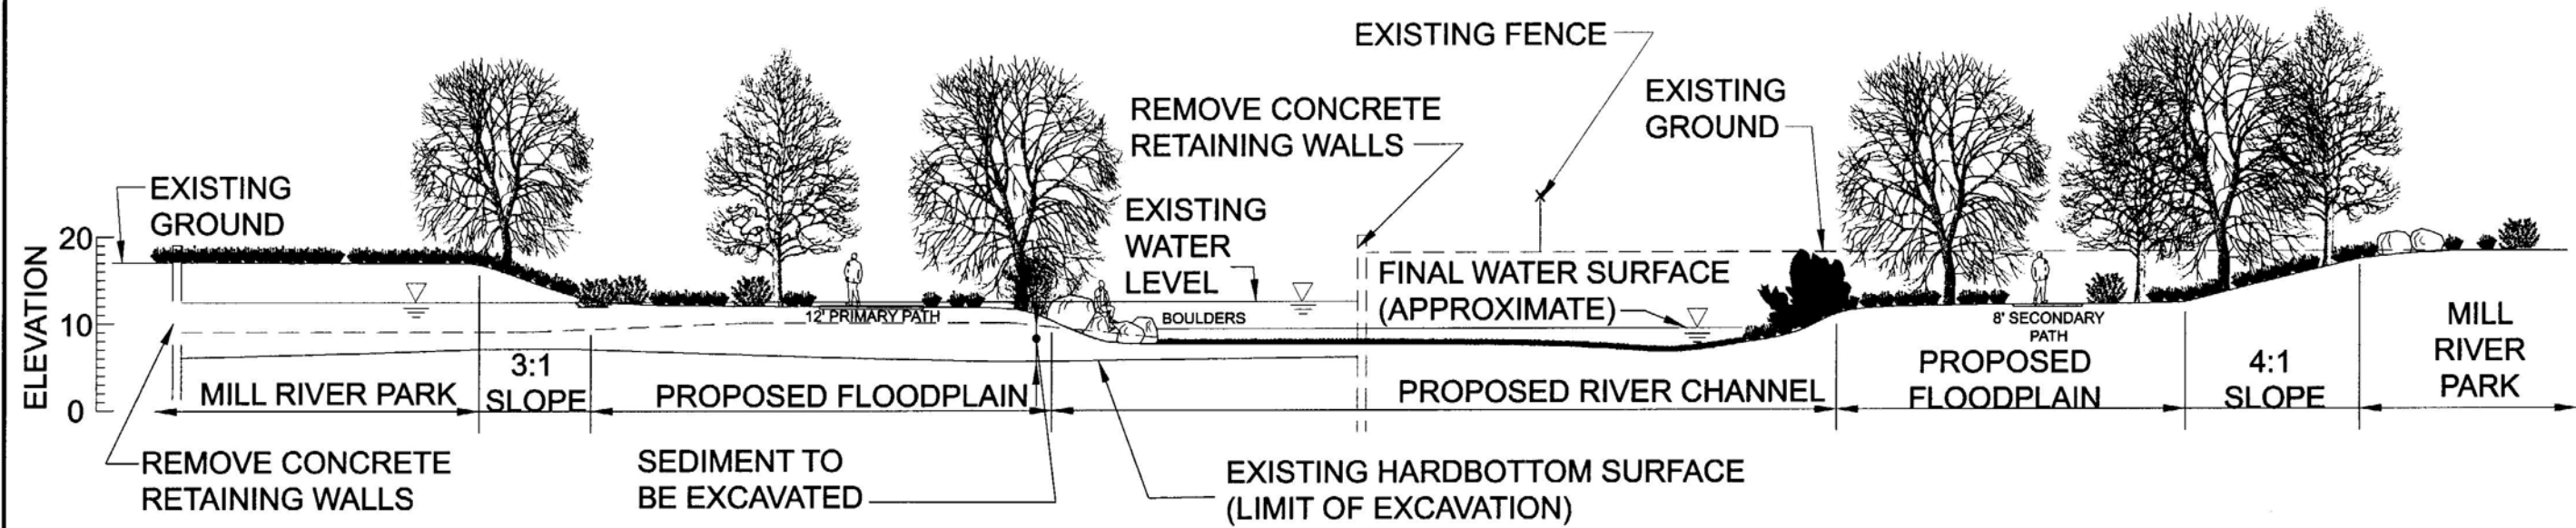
Proposed Mill River Channel Restoration and Dam Removal within Mill River Park
